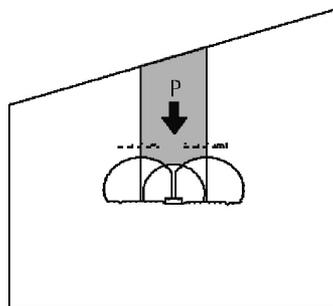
The load acting on pillar of 2-Arch tunnel in soil and weathered rocks (Matsuda, 1998).
